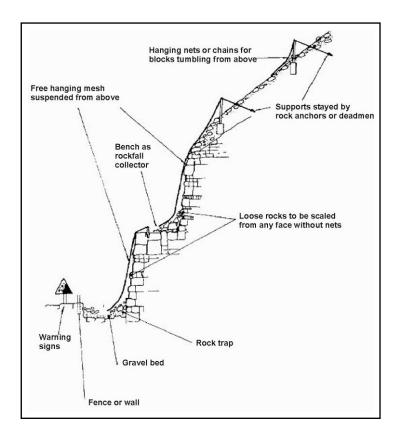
Rockfall control by free hanging mesh drape and its installation. It is commonly used for permanent slopes. It can be used effectively at the right flank of the Marun dam (after Fookes and Sweeney, 1976).
